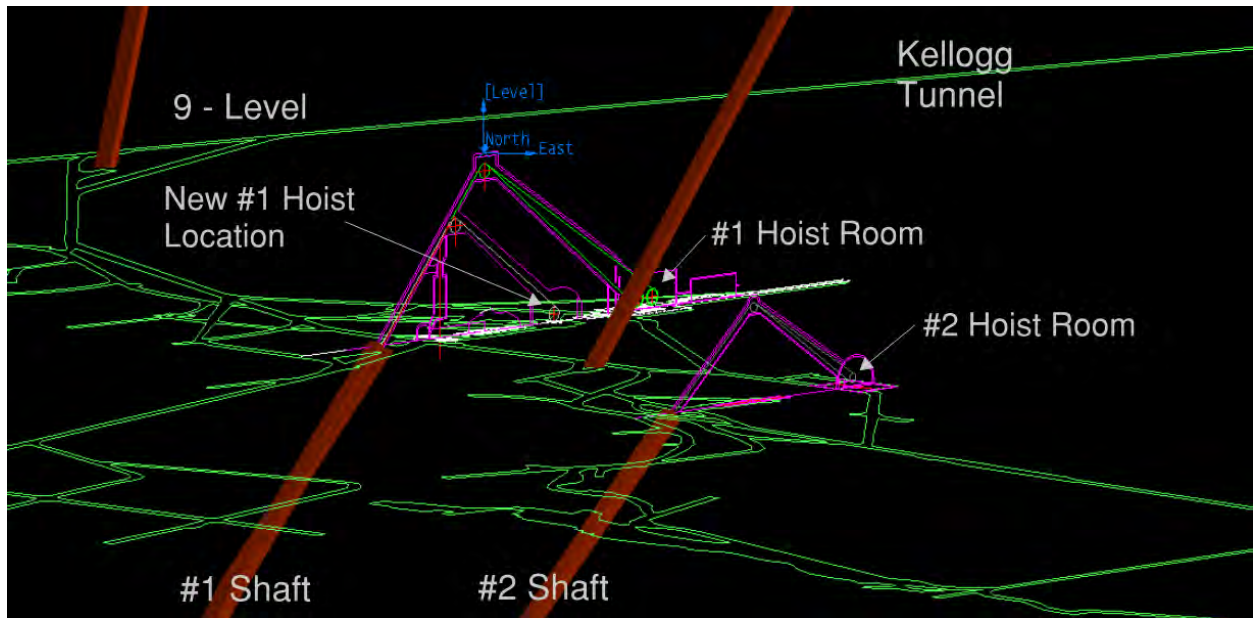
#1 & #2 Hoist Rooms Area View Looking North-Northwest
